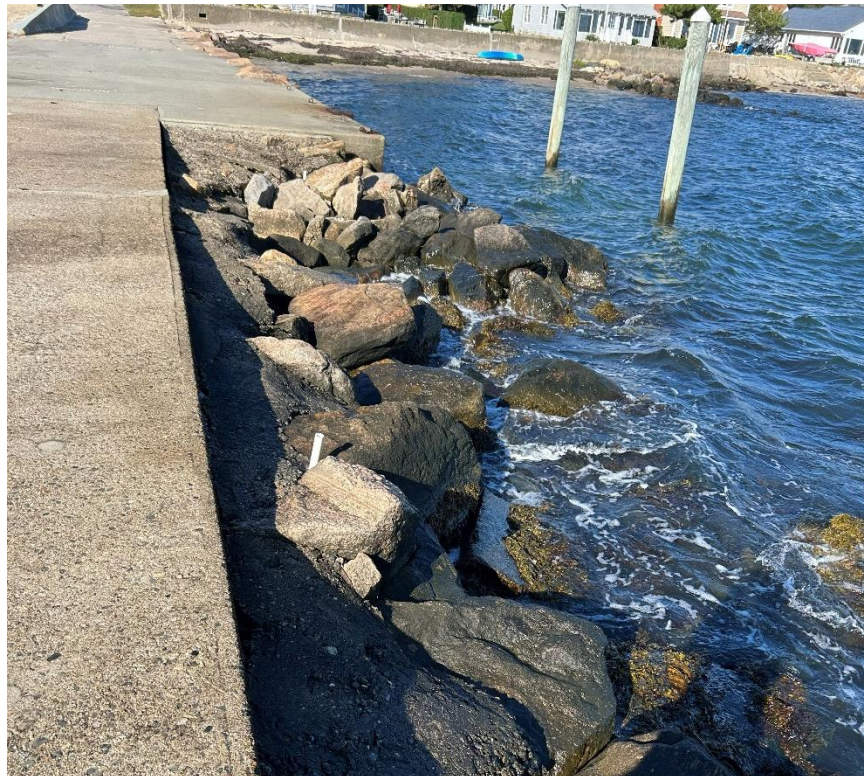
Osprey (South Beach) pier displaced armor stones North side end
